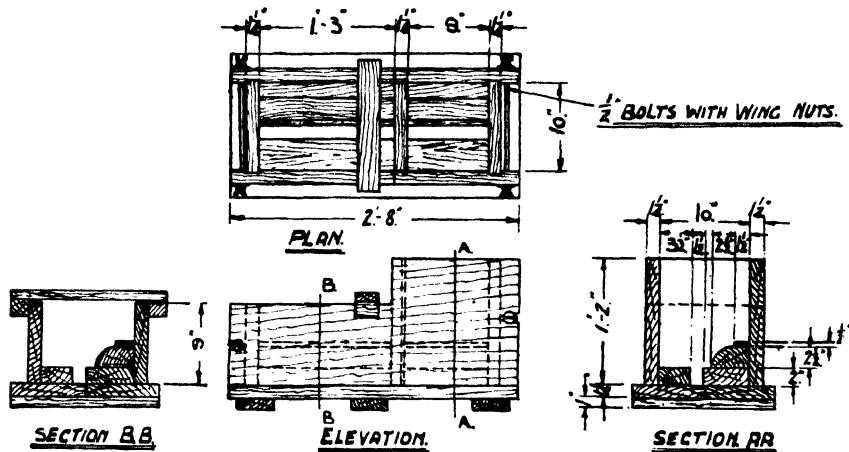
MOULD FOR BLOCKS A AND B OF CONCRETE DOORWAY
